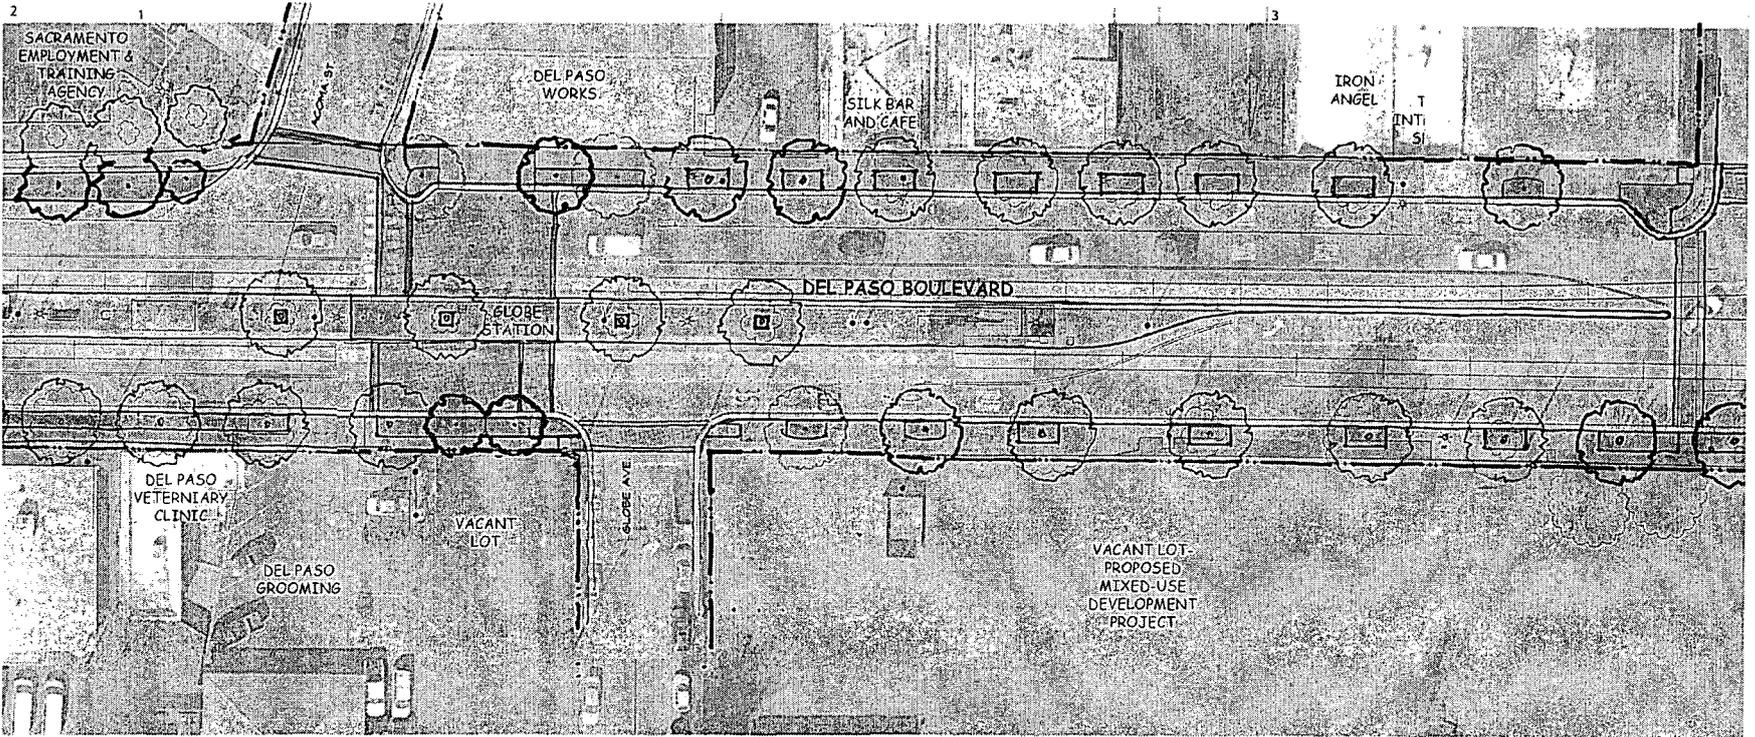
% Design Plans – Barstow Street to Colfax Street
